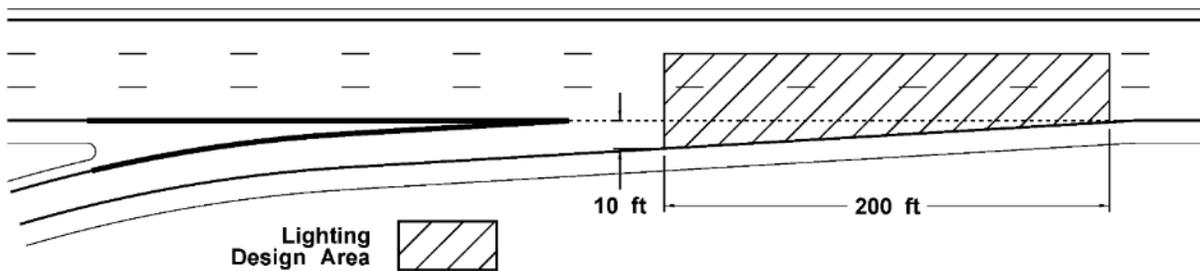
Off-Ramp Lighting Design Area Adjustment Limit
